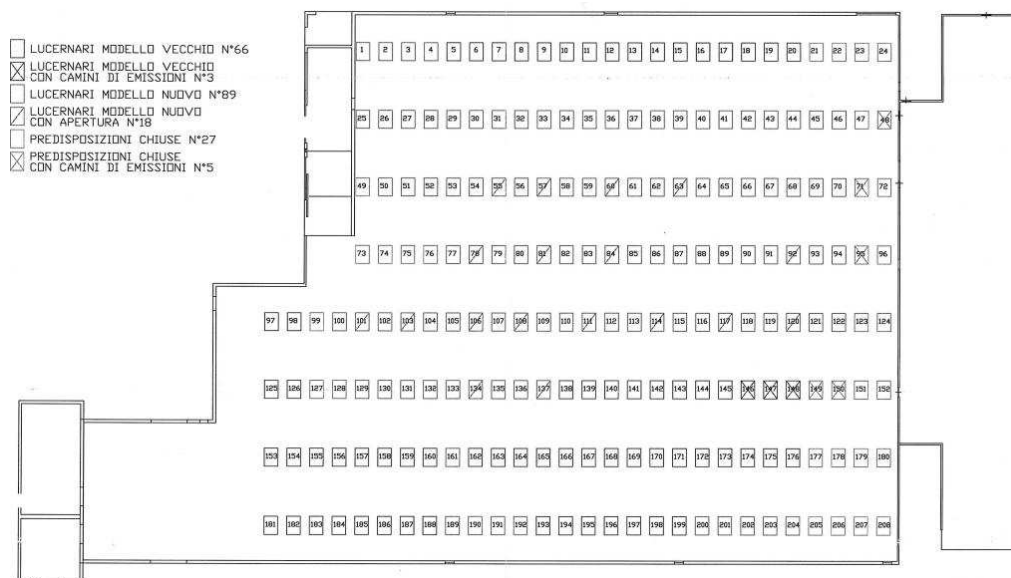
Plan of the coverings of the Ansaldo STS industrial plant in Tito (Potenza, Italy).
